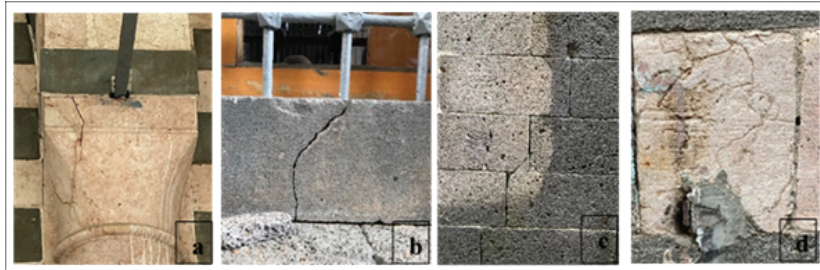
Capillary and Structural Crack Formation a. Corbel on the Arch on the North Façade b. Window on the West Façade c. West Façade Wall d. East Façade Wall
